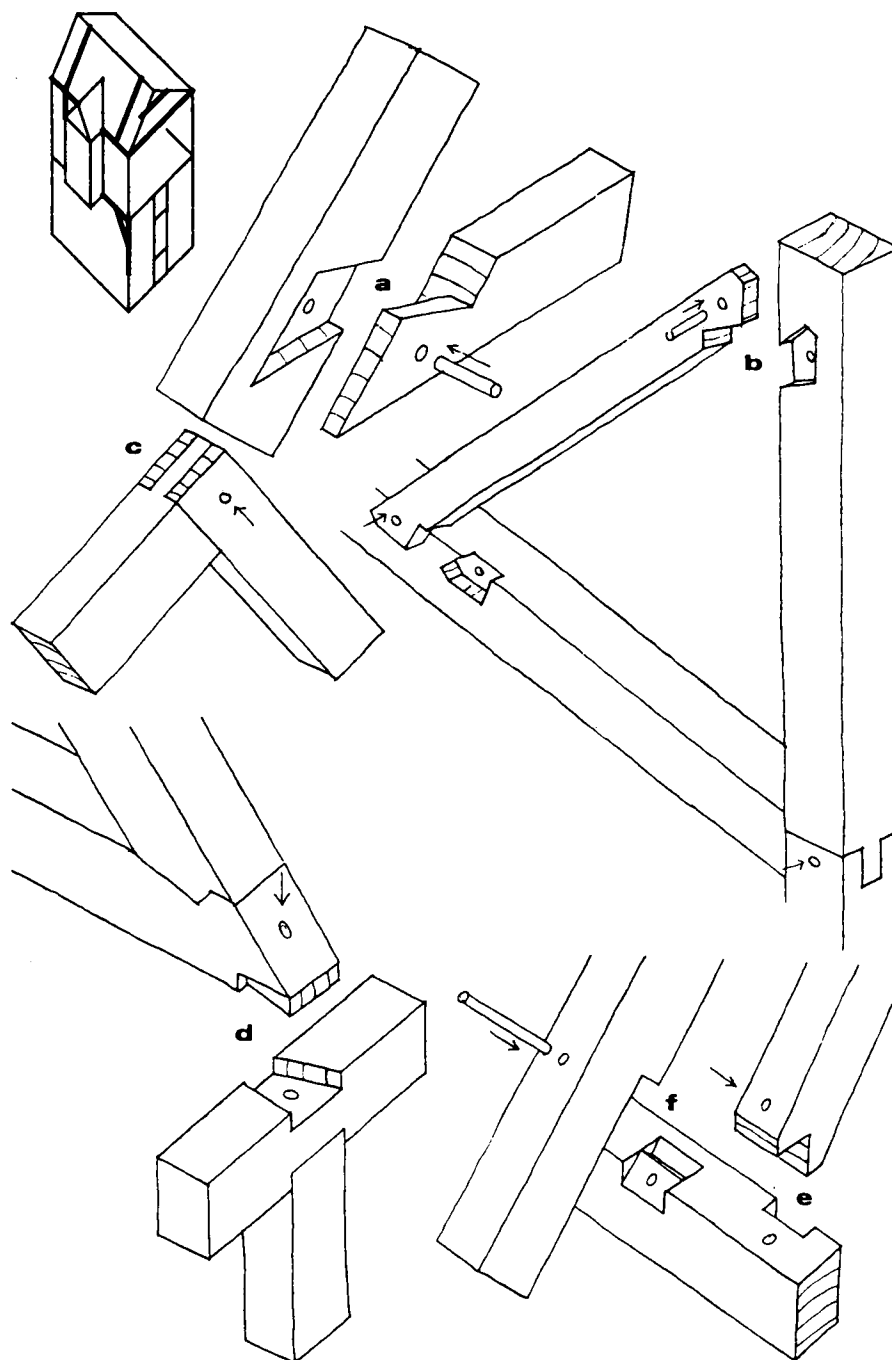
Knee and roofing joints: a) Half lap halved stop dovetail at rafter tie; b) Half lap halved stop dovetail at knee bracing; c) Open mortise and tenon at ridge; d) Front notch rafter with halved dovetail tie beam on housed post and plate; e) Housed bird's mouth; f) Step lapped. The location of the joint in the framing system is shown on the upper left corner of the Figures 6–10.
